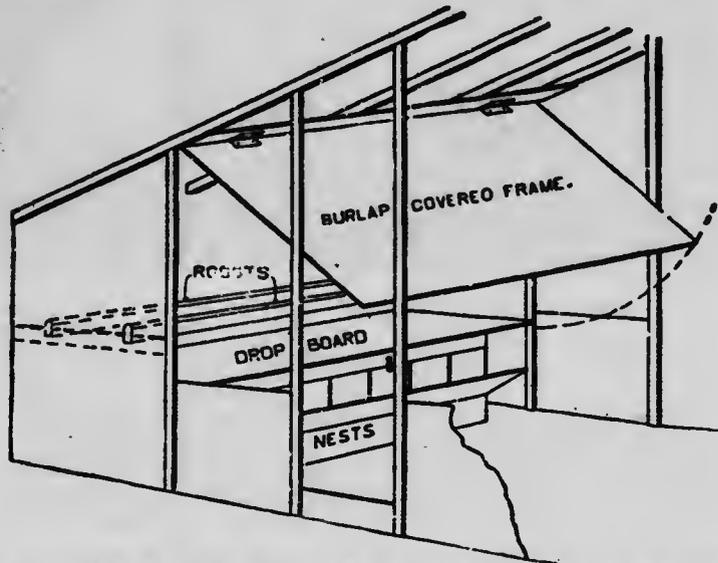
INTERIOR VIEW OF SINGLE STYLE OF POULTRY HOUSE, SHOWING POSITION OF NEST, DROP BOARD, AND BURLAP CURTAIN.
